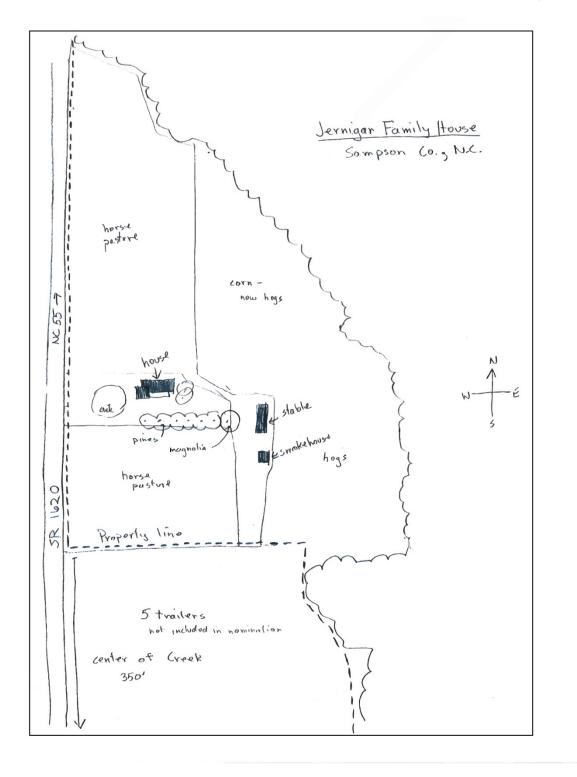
Site Plan prepared for the Lewis Jernigan House in 1979. Note the orientation of the house to the south (Source: Jernigan Family House, State of North Carolina Division of Archives and History Individual Property Form, 1979).
